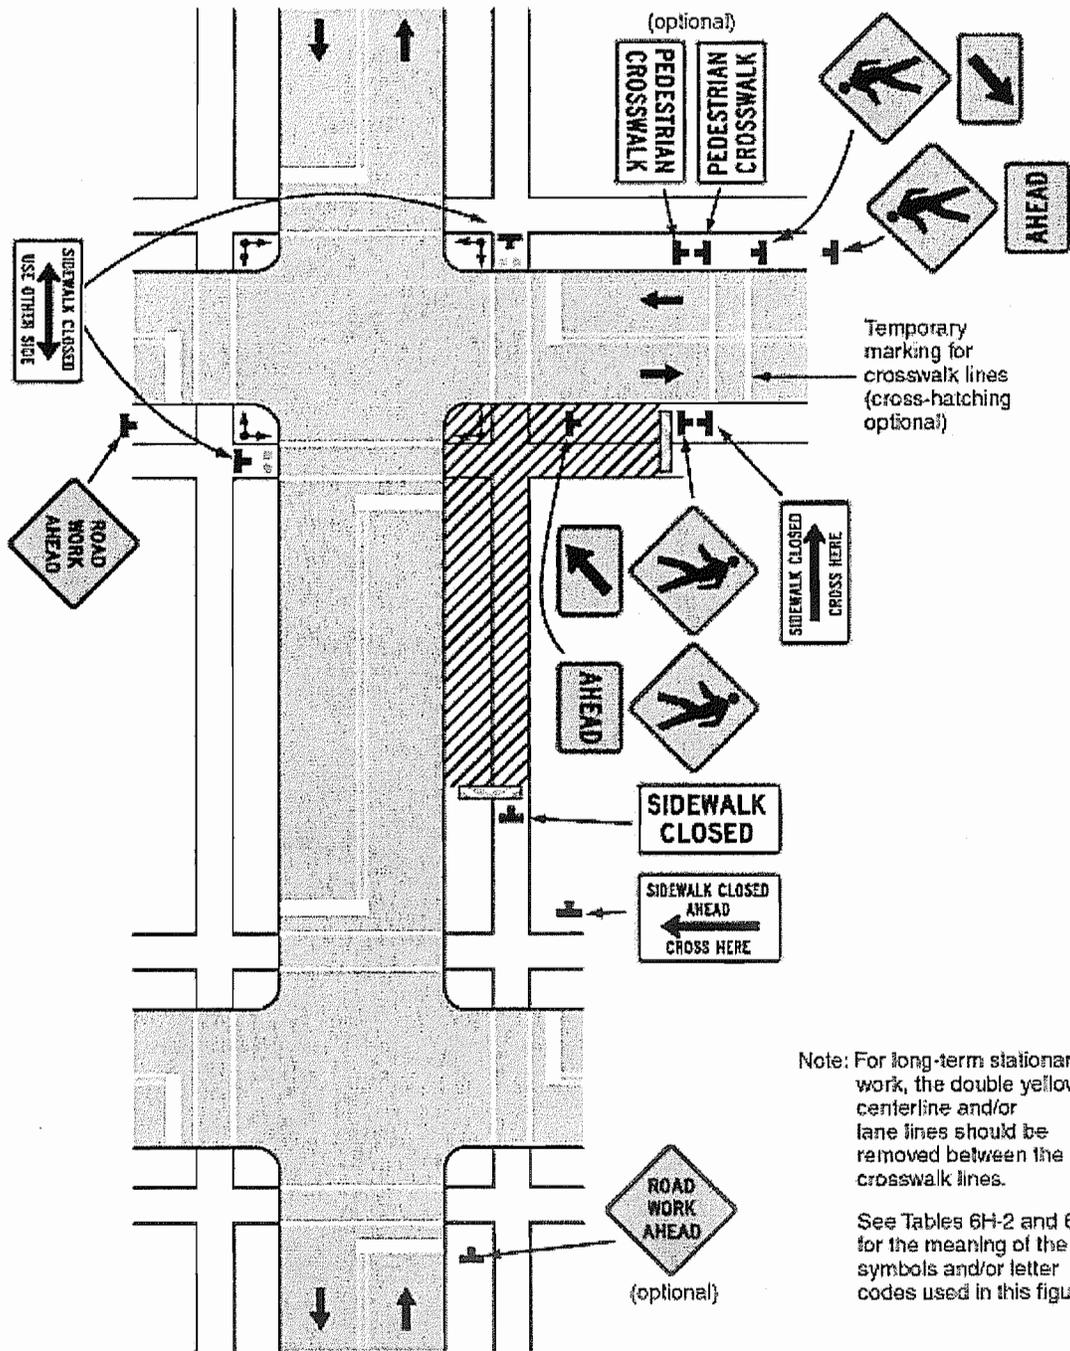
H-28. Sidewalk Detour or Diversion (TA-28)
